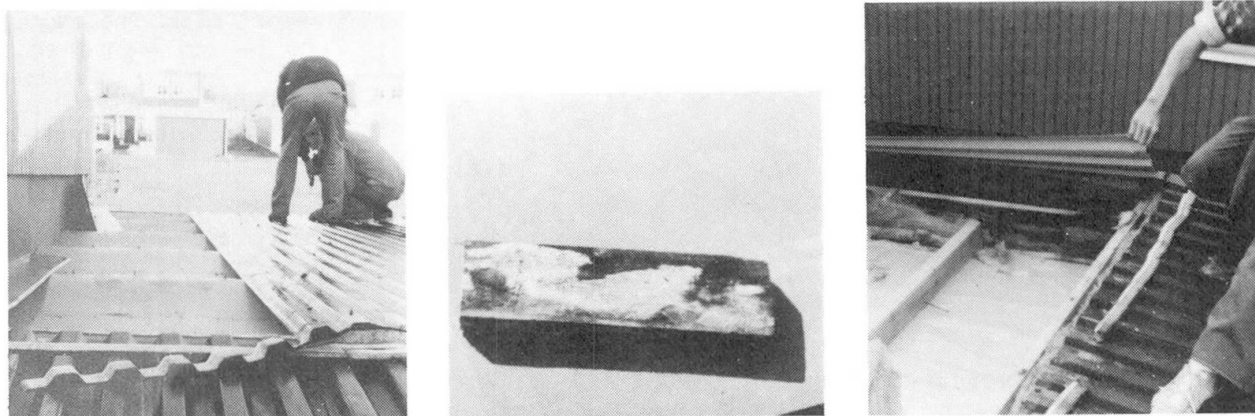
Moisture damaged flat roof with metal sheeting. Moisture penetration from both the inside and the outside. The fibre board hung down, thus blocking the vented air space. The moisture content in the construction increased and caused mould and rot damage. (Example 1.)
